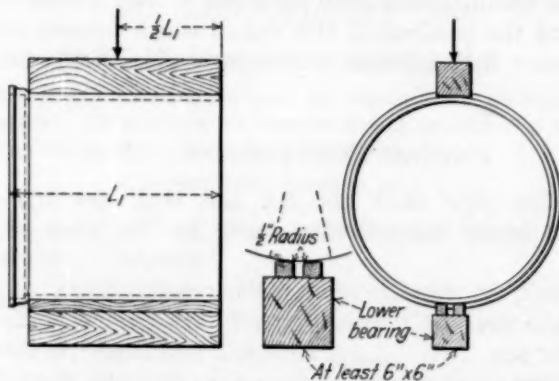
Three-Edge Bearings for Pipe with Bell End.
